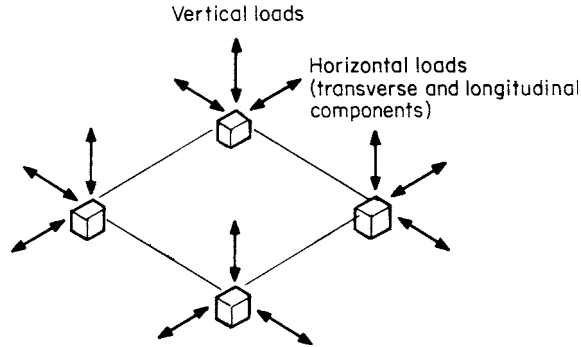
Typical loads acting on lattice-tower foundations.
